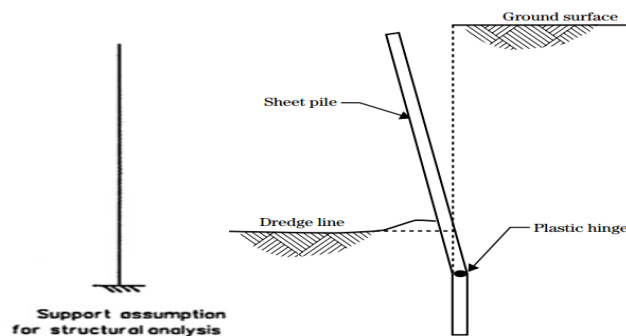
Assumed Support and failure for cantilevered sheet pile wall (Technical Supplement 14R 2007)
